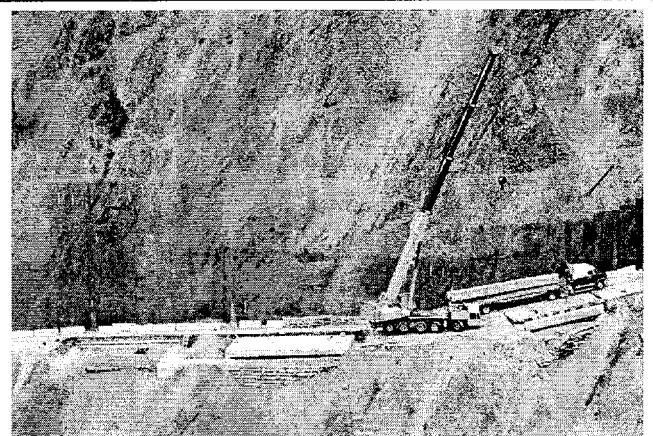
Overview of Timber Crib Replacement, Highway 12 at Texas Creek
